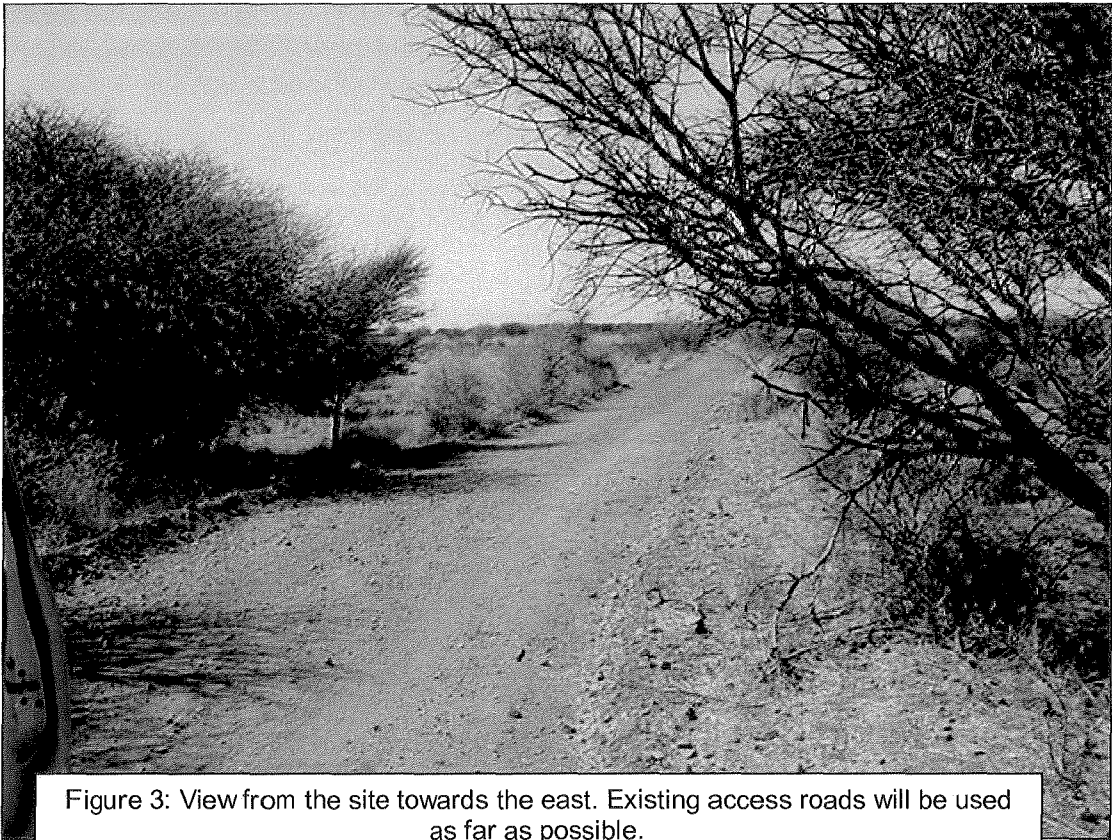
View from the site towards the east. Existing access roads will be used as far as possible.
